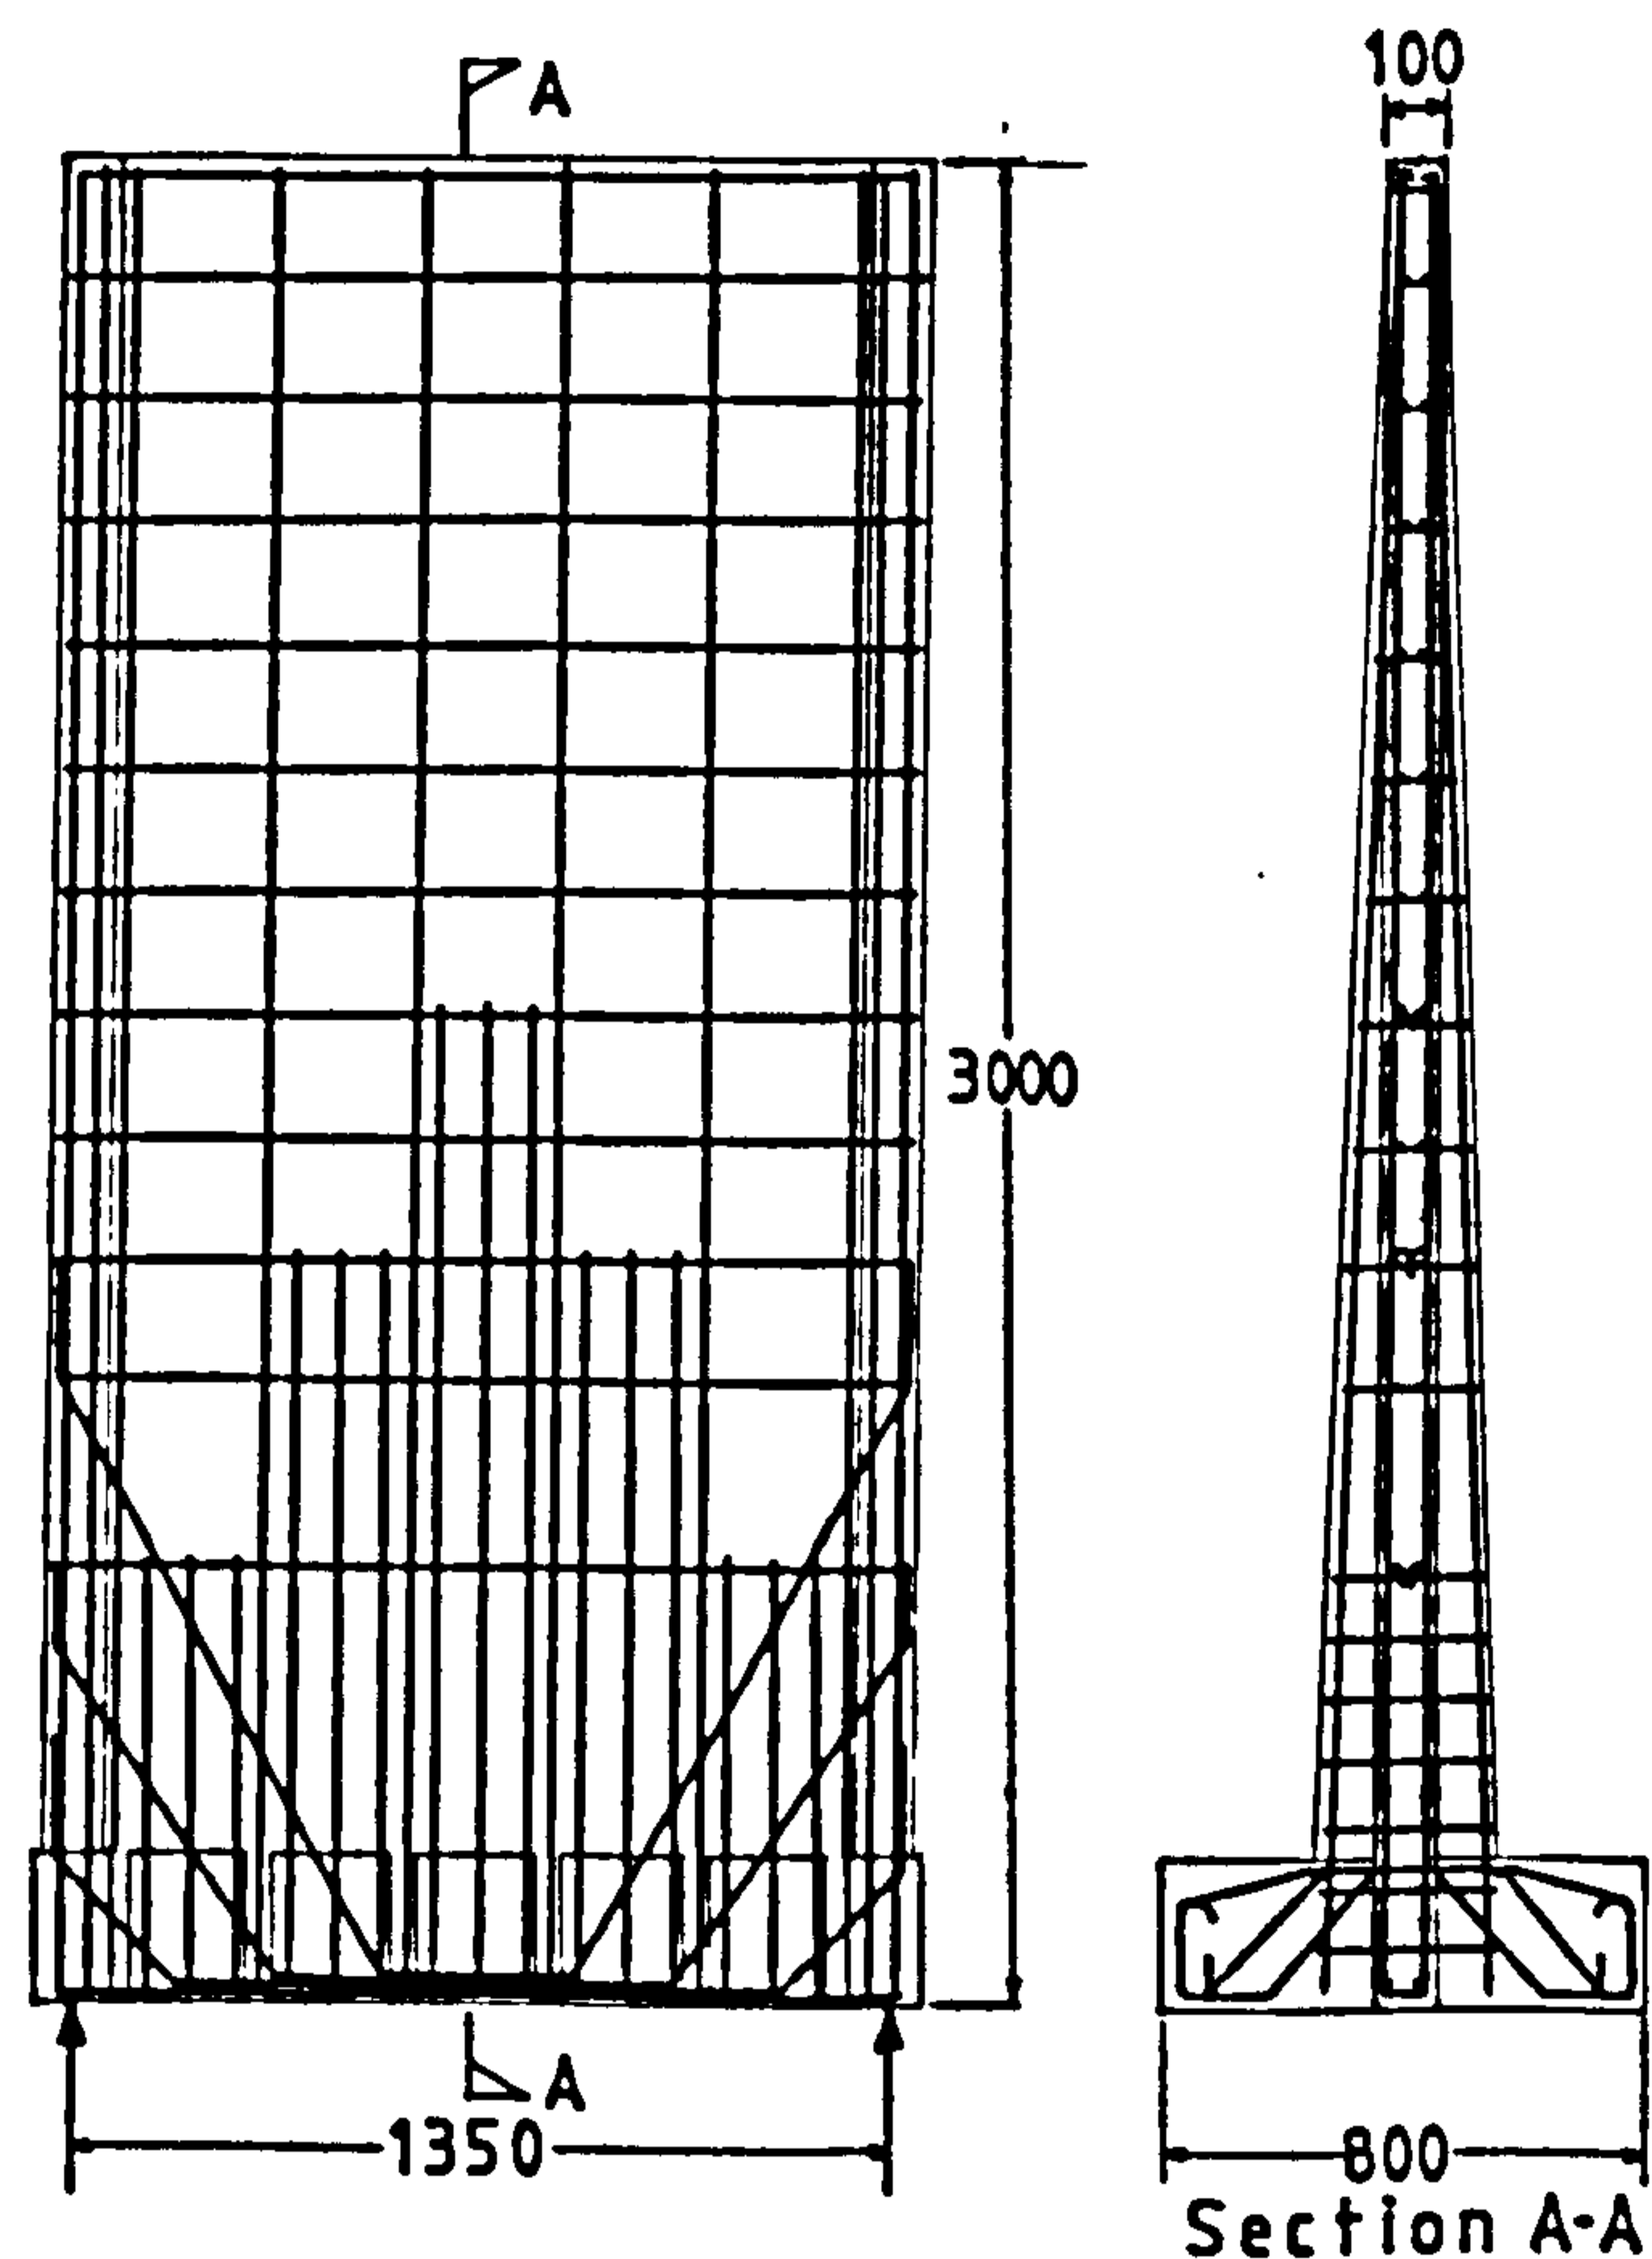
Geometrical and reinforcement details of specimen tested by Graf et al (1943)
